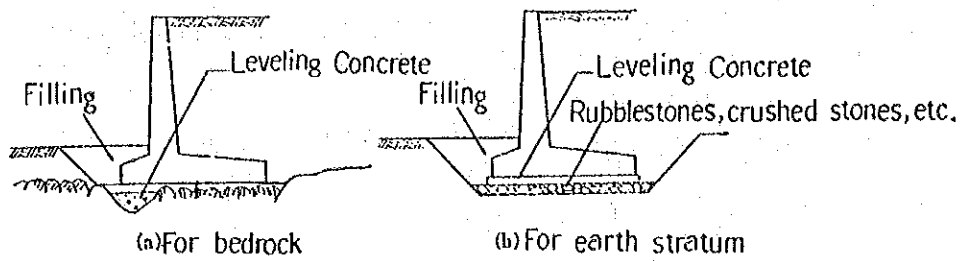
SPREAD FOOTING FOUNDATION
